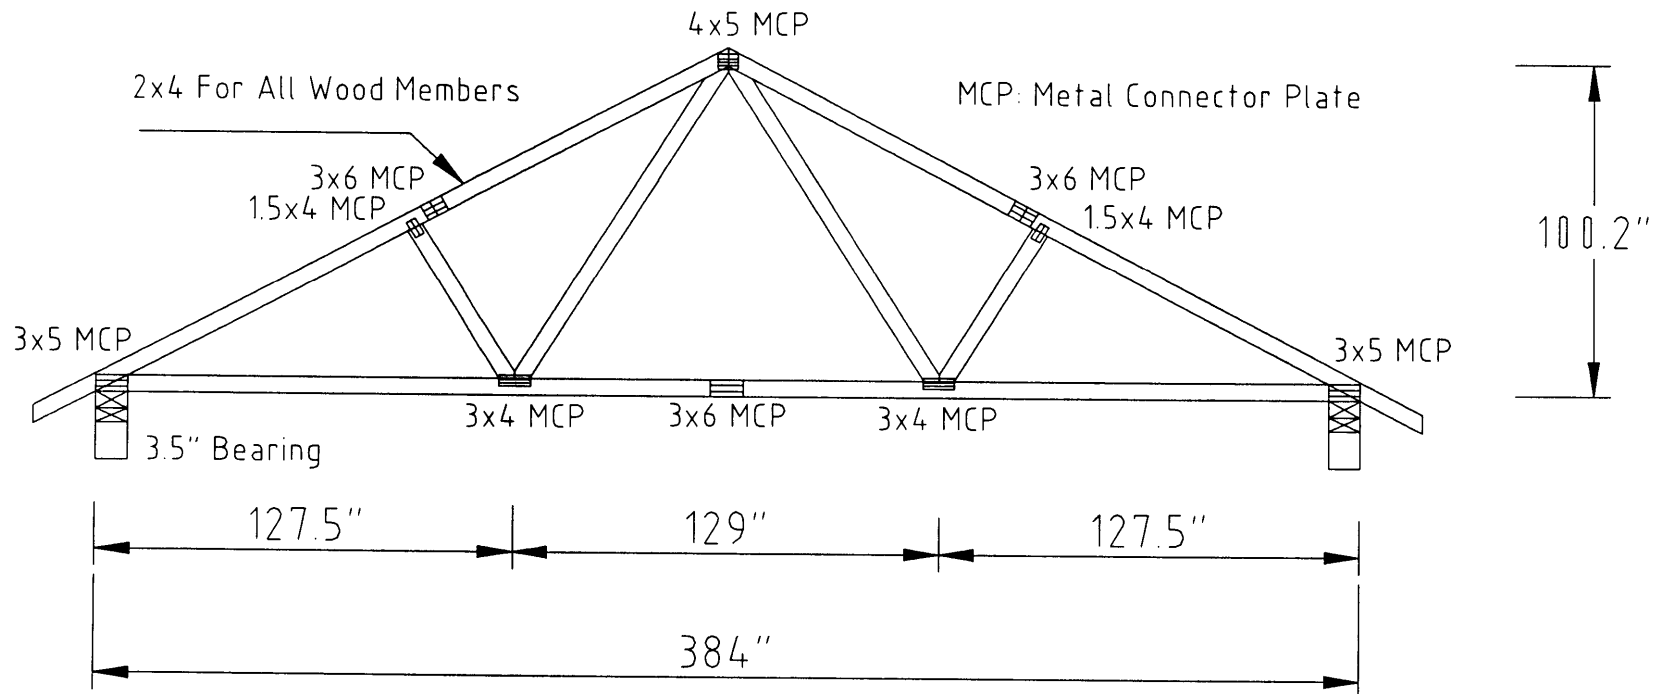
MPC Truss Type A from a Truss Plate Manufacturer
